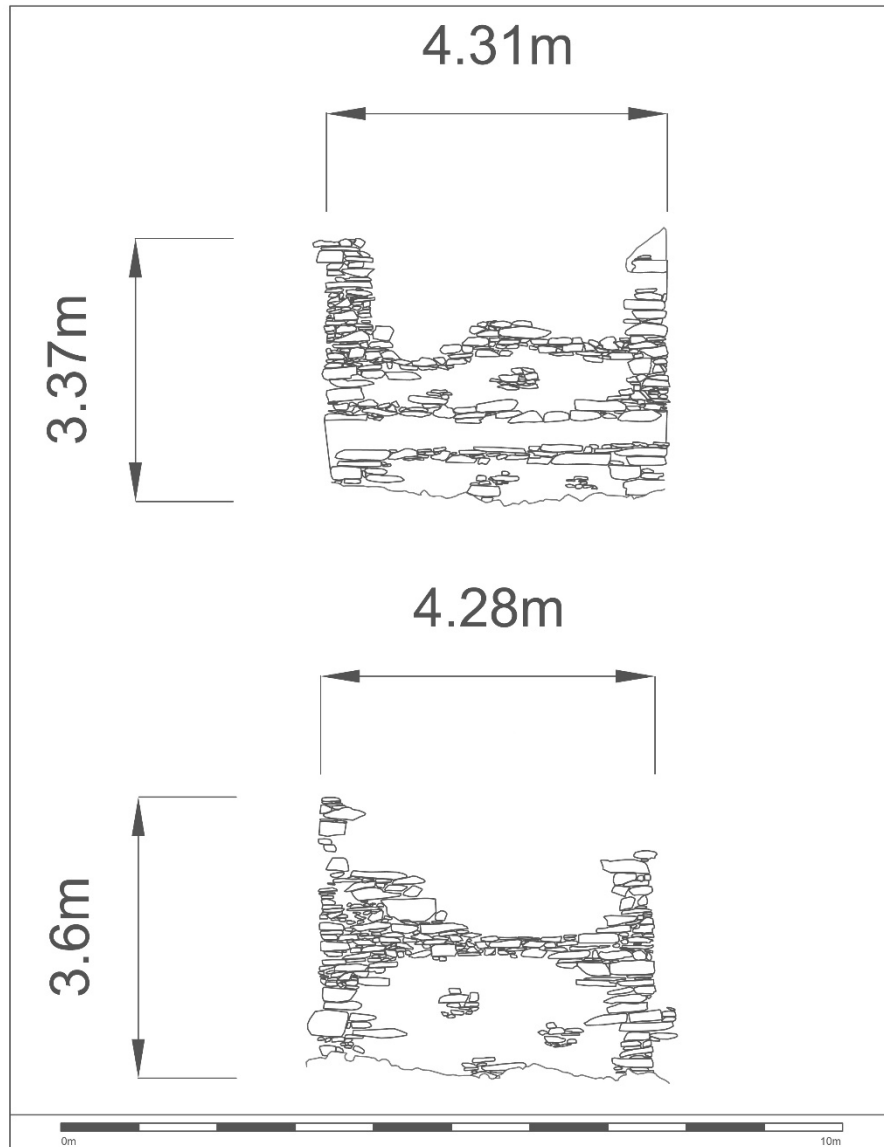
Internal elevations of the north (top) and west (bottom) walls of Inishturk Signal Tower.
